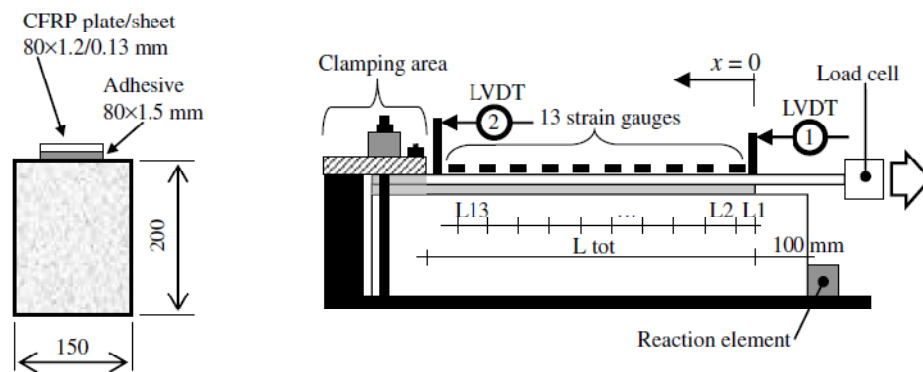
Experimental Set-Up: (a) Specimen Transverse Section; (b) Side View with Instrument Position and Clamping System for Both Concrete Specimen and CFRP Plate (Mazzotti et al., 2008)
